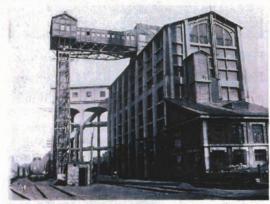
Reinforced concrete construction of the Blast furnace of the Coke-chemical plant in Tscheglovo (Kemerovo), designed by Olivier Piëtte, 1916.
